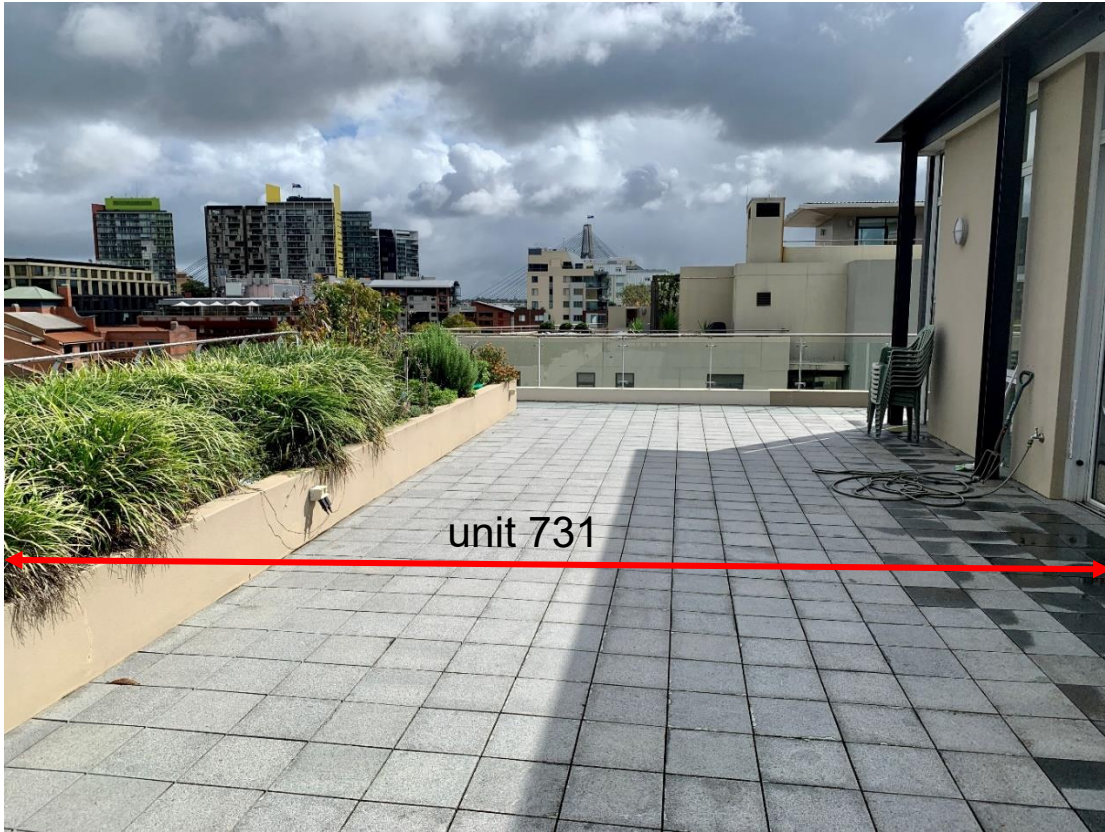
Unit 731 as viewed from private terrace looking west towards 43-81 Point Street
